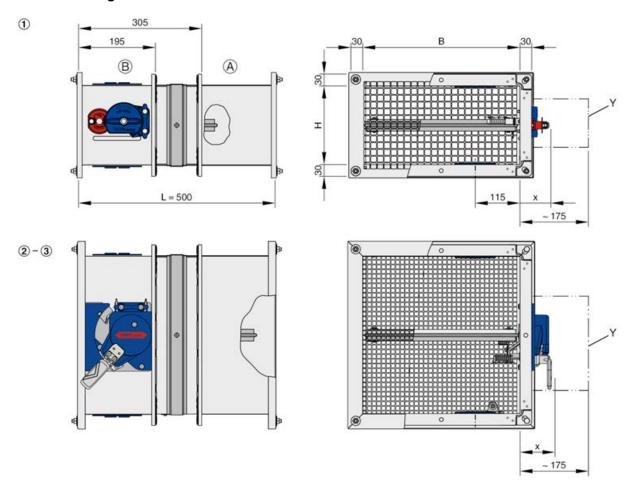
FKA2-EU with fusible link and cover grille as air transfer unit
